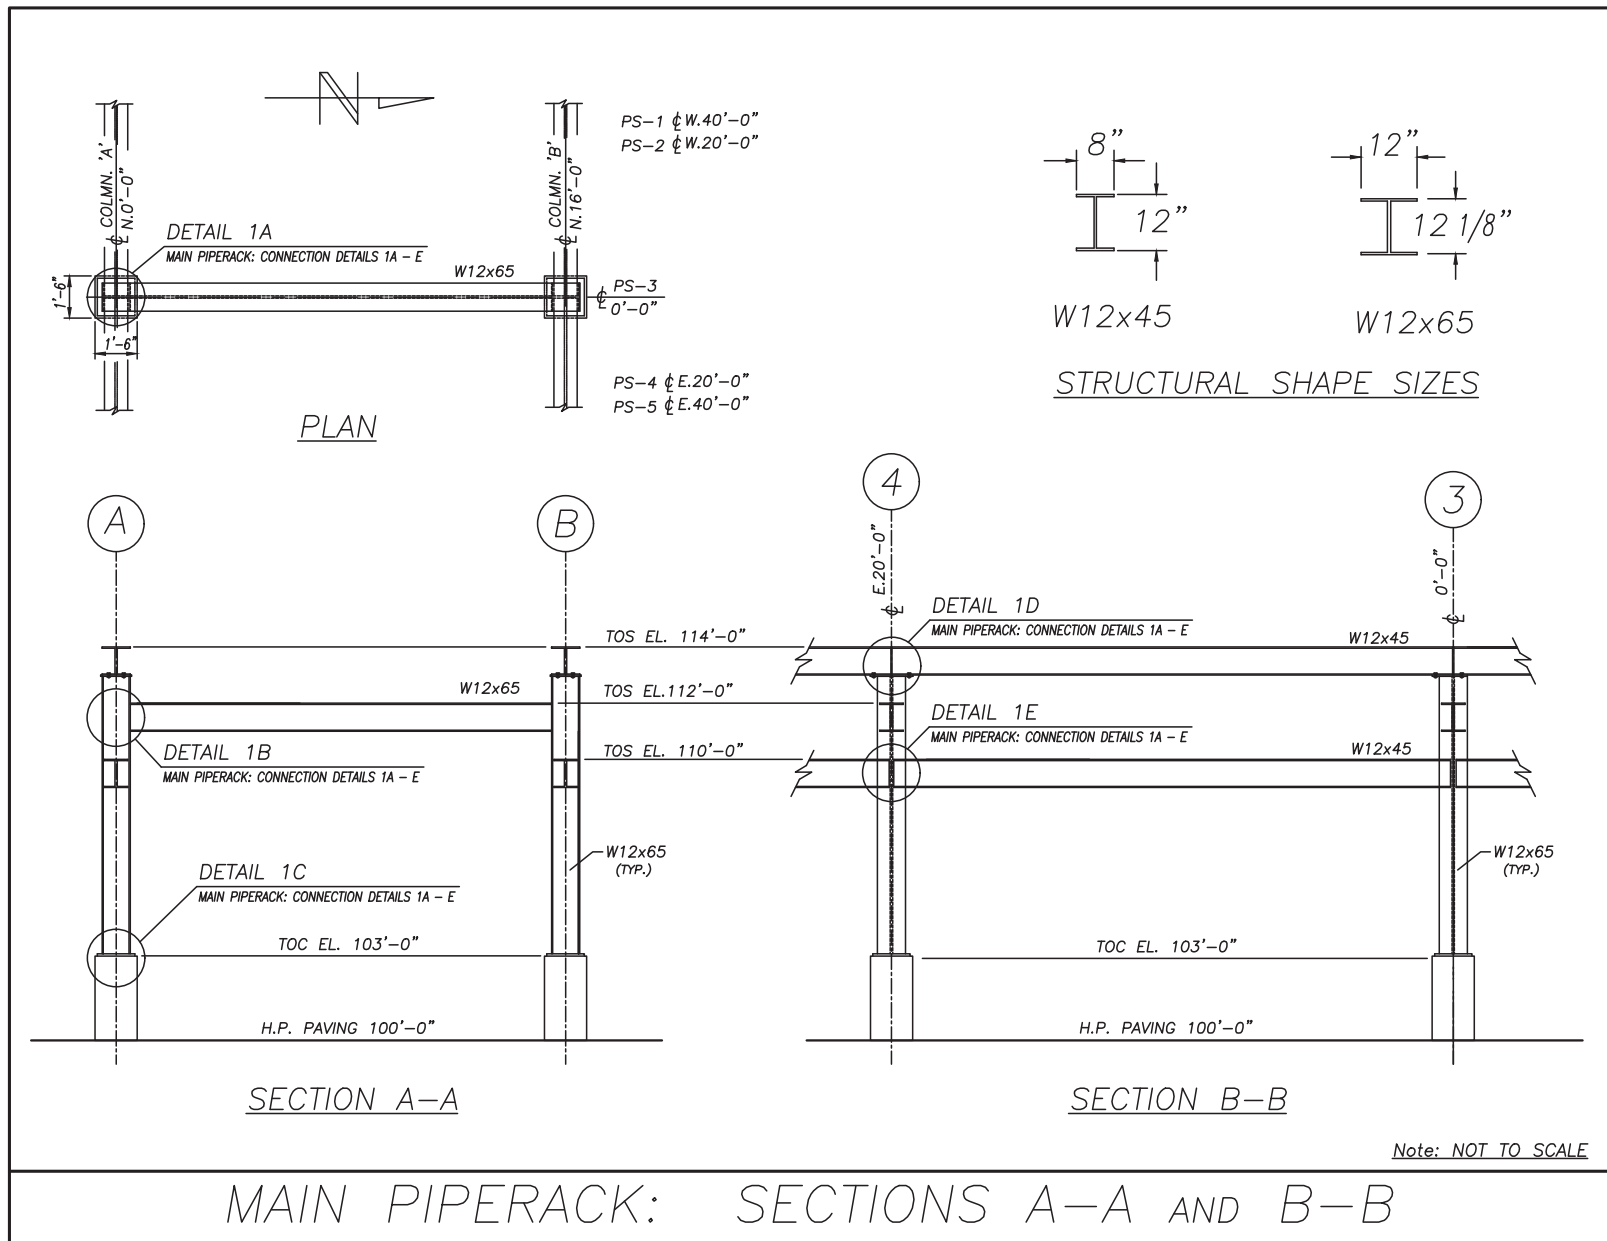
Main Pipe rack; Sections A-A and B-B.
